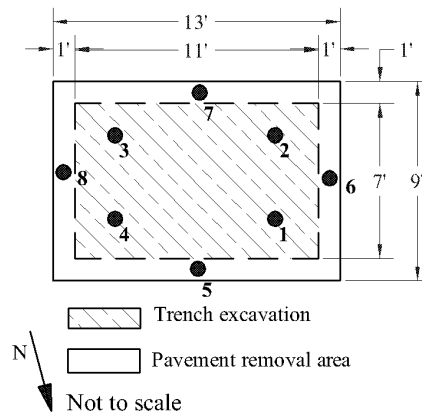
Location of test points in Trench D; cross-section of the trench
